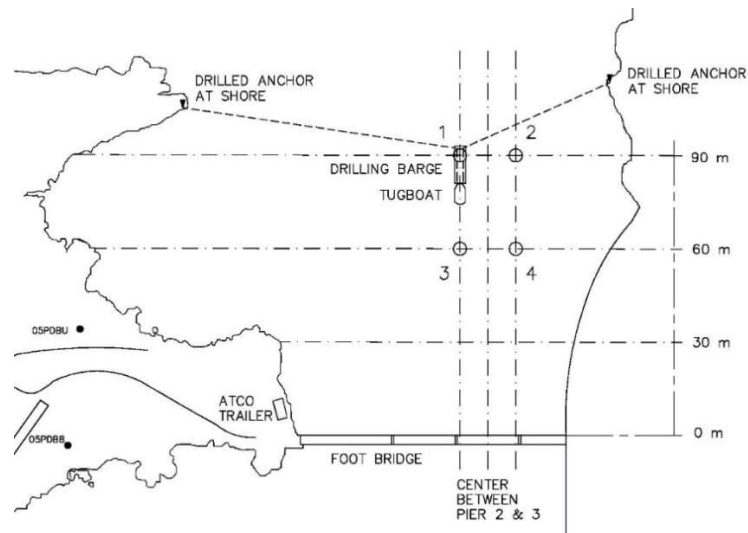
Anchoring plan showing selected anchor locations numbered 1 to 4, two shore anchor points for positioning winch connections and relationship to the footbridge and test site, located between Piers 2 and 3.
